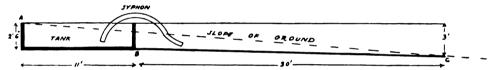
Elevation showing layout of experimental plant. A, Sullage inlet by surface drain to proximal side of tank sunk to ground level. B-C, Effluent drain 1 foot 9 inches deep at B, and reaching the surface at C.
